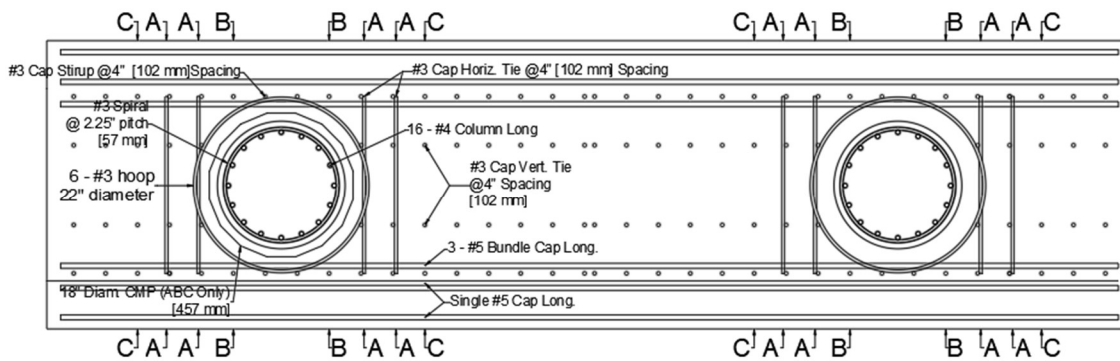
Plan view of cap beam reinforcement and locations of cross-sections
